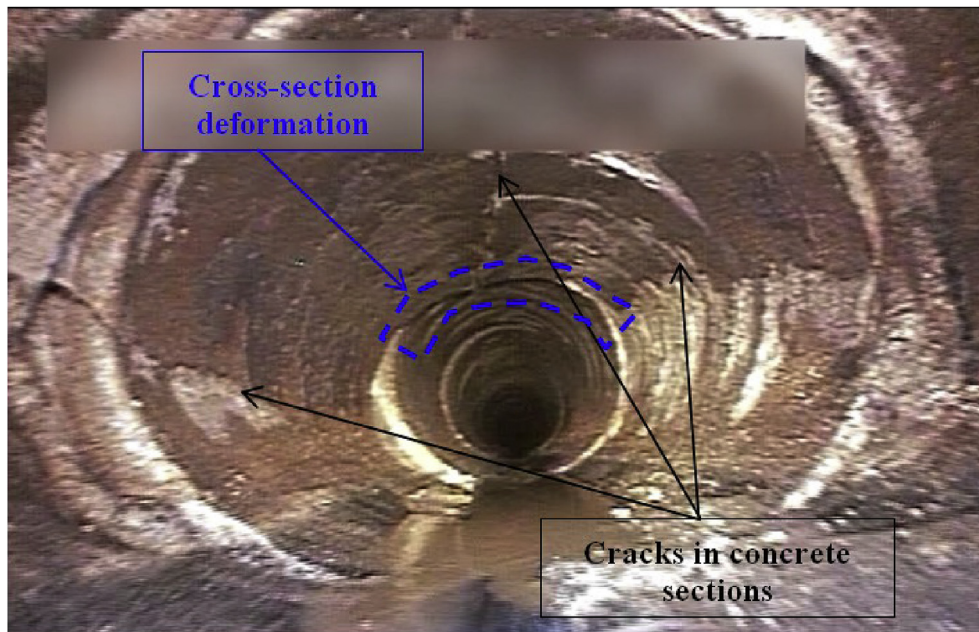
Example of damage to a sewer built of concrete pipes.
